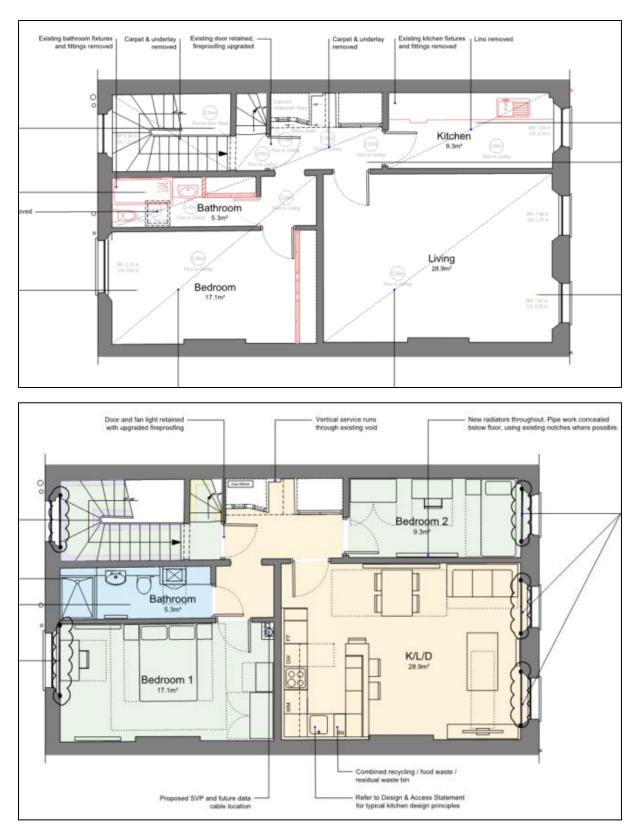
Existing (top) and proposed (bottom) second floor plan.
